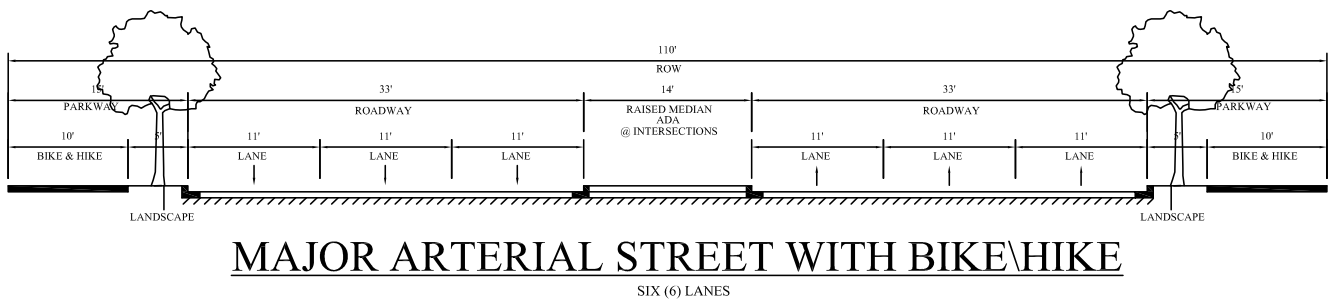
Recommended cross section for arterial roadway reproduced from the Design Standards for Construction
